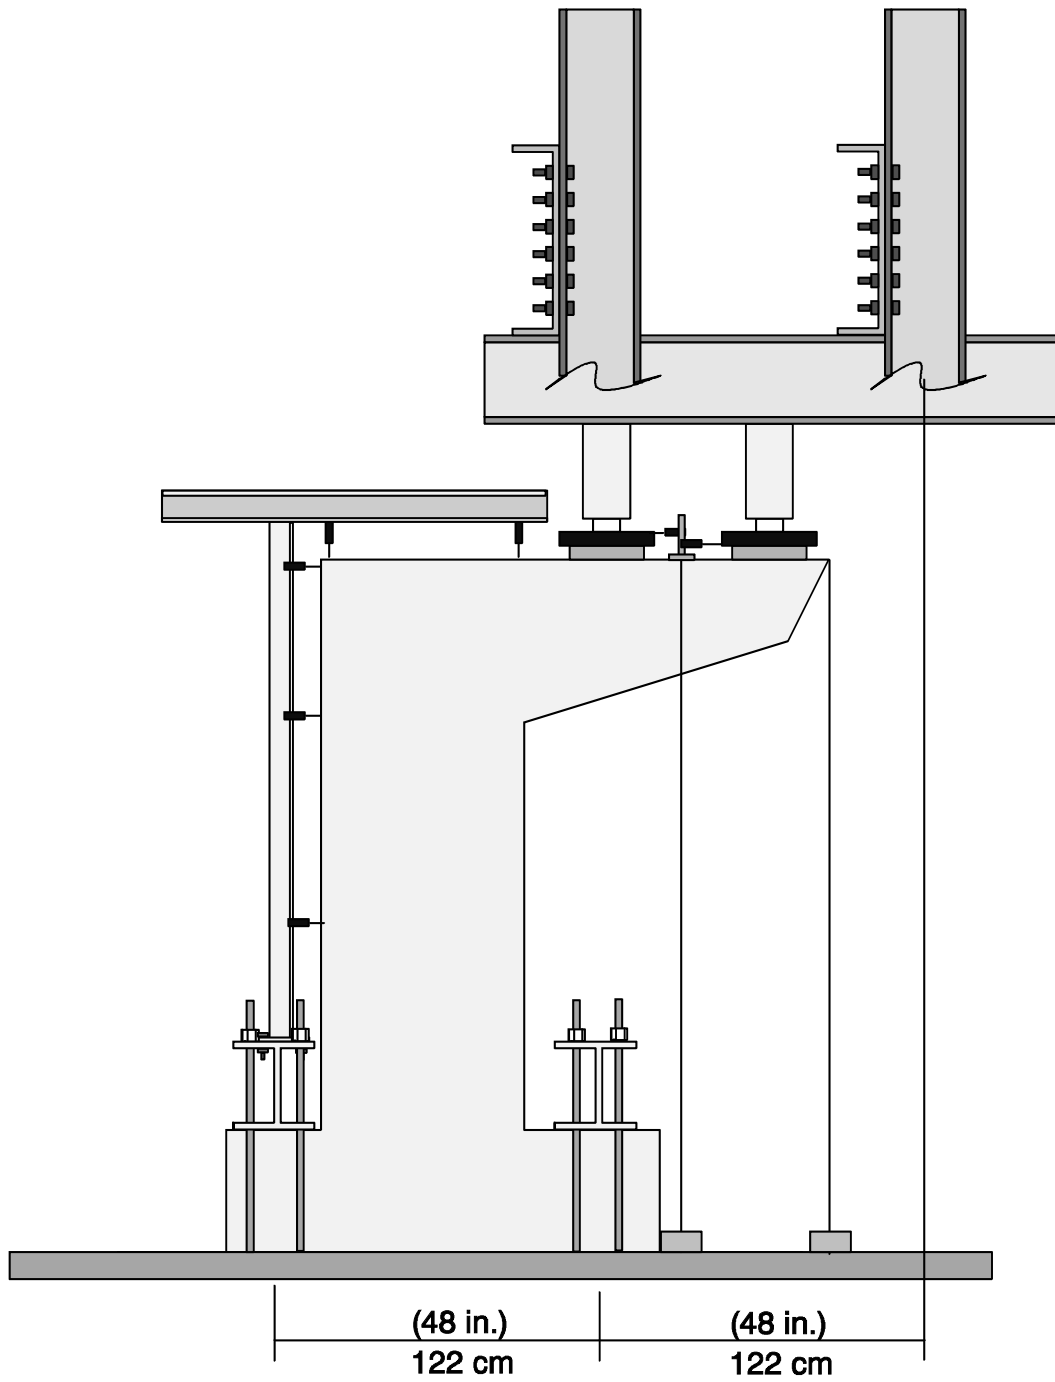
Loading Frame with Columns Cut Away to Show Rams and Floor Anchorage
